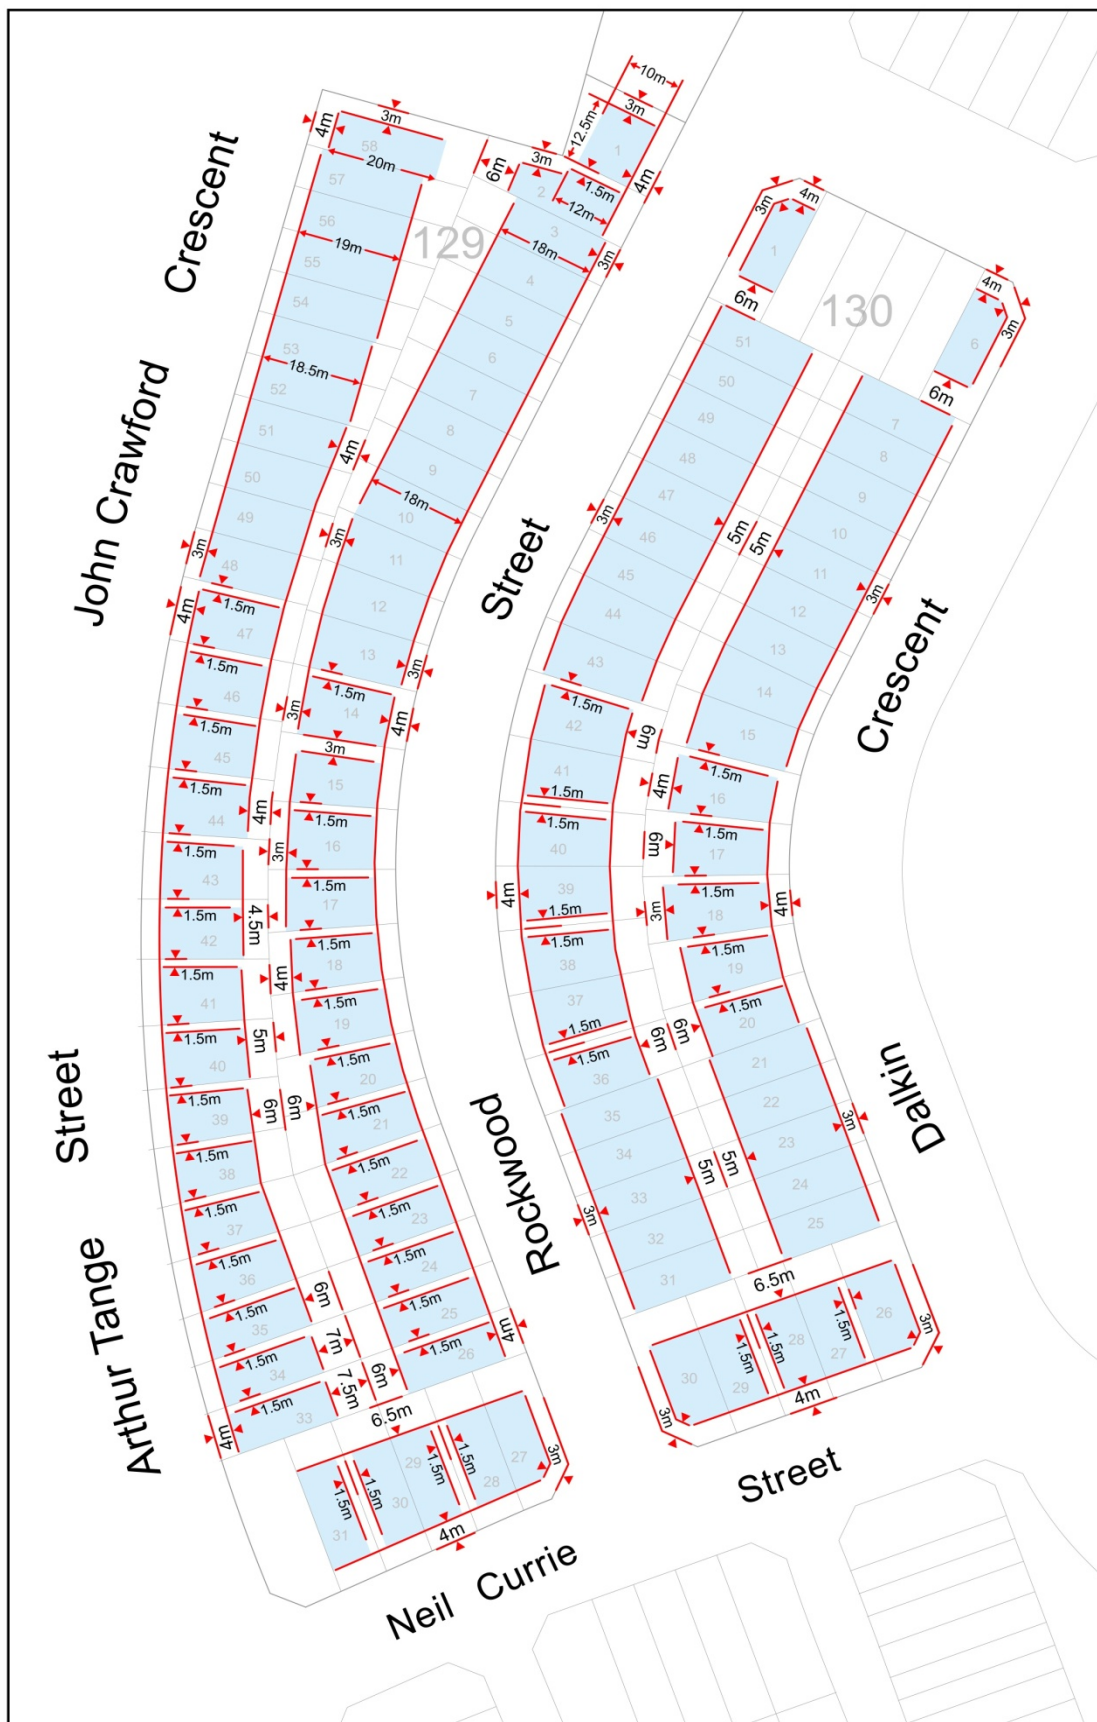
Detail of Maximum Building Zone - sections 129 and 130
